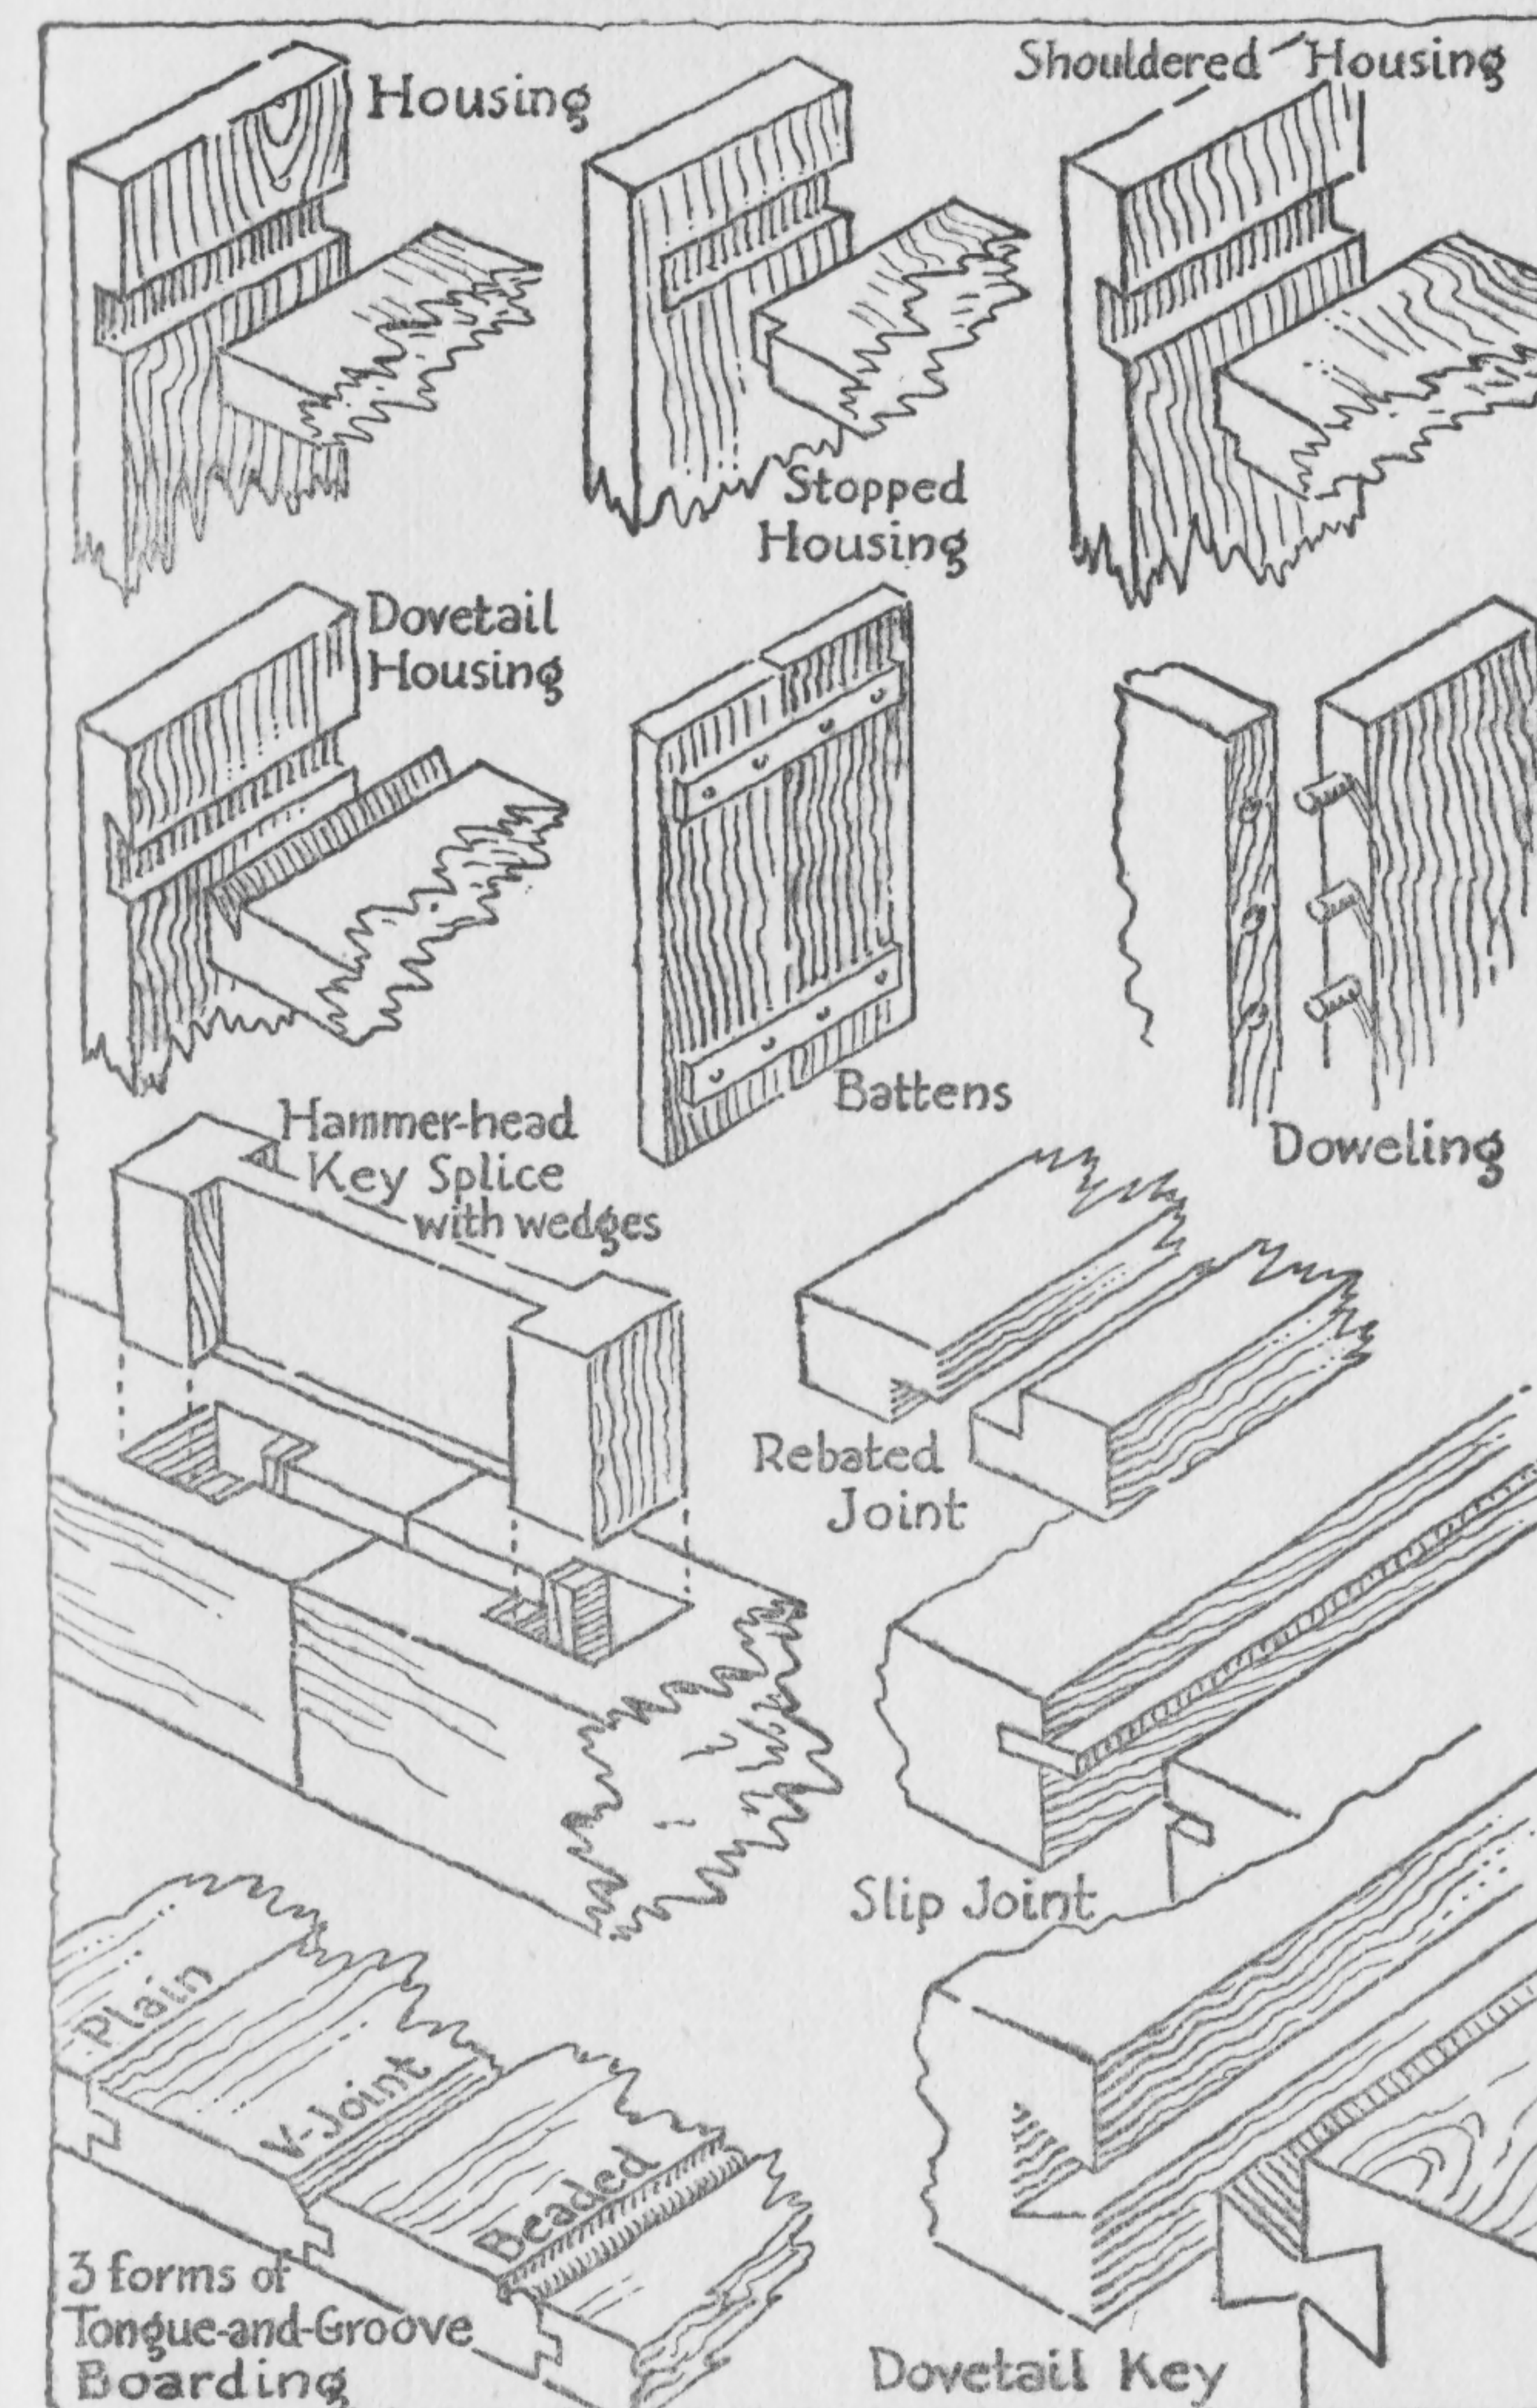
Housing; battens; doweling; rebated, slip, tongue-and-groove, and dovetail key joints.
